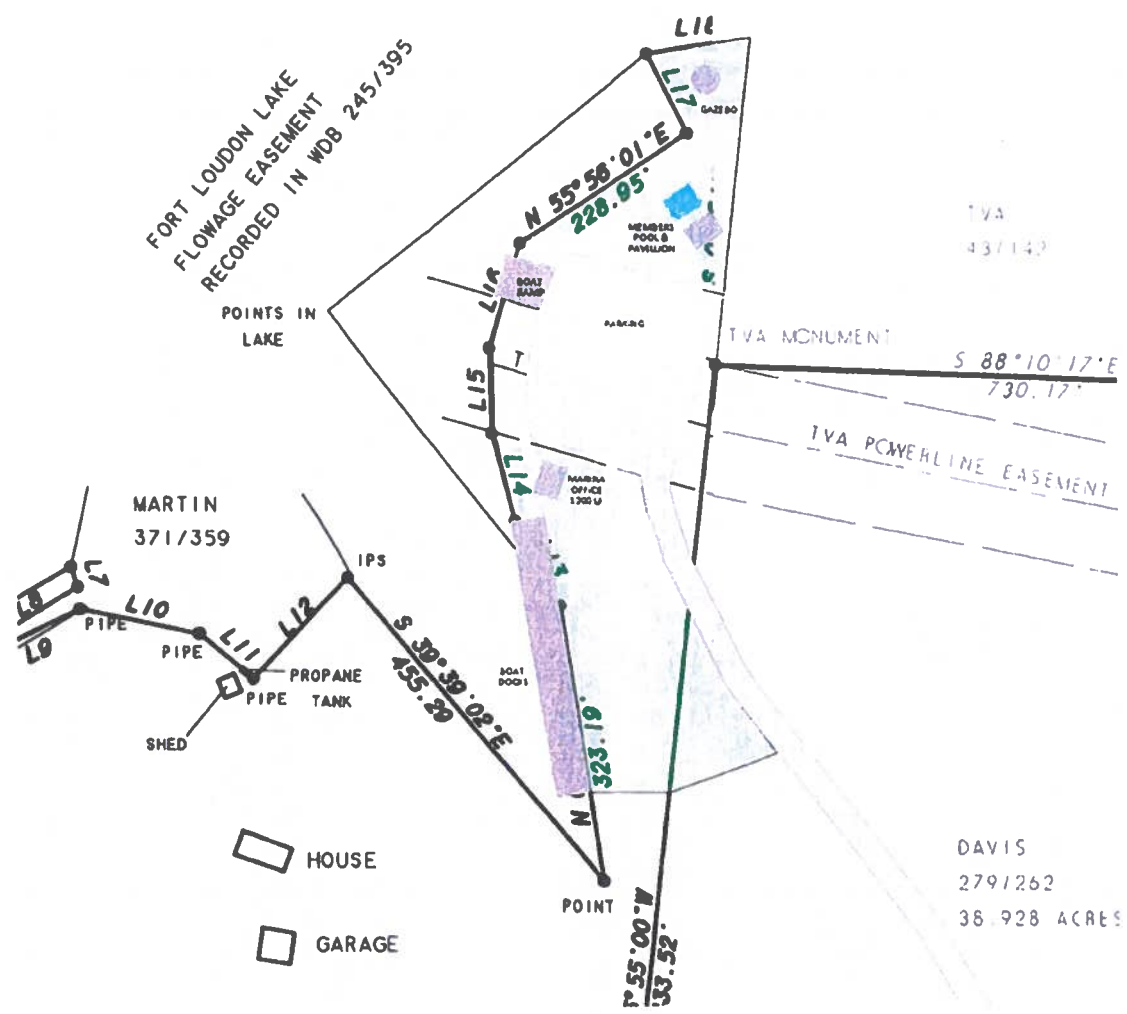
As referenced in this design plan, Defendant represented to the Board of Zoning Appeals that he sought a special exception to construct one set of boat docks, a parking area, a boat ramp, and a pool and pavillion for “members.”
